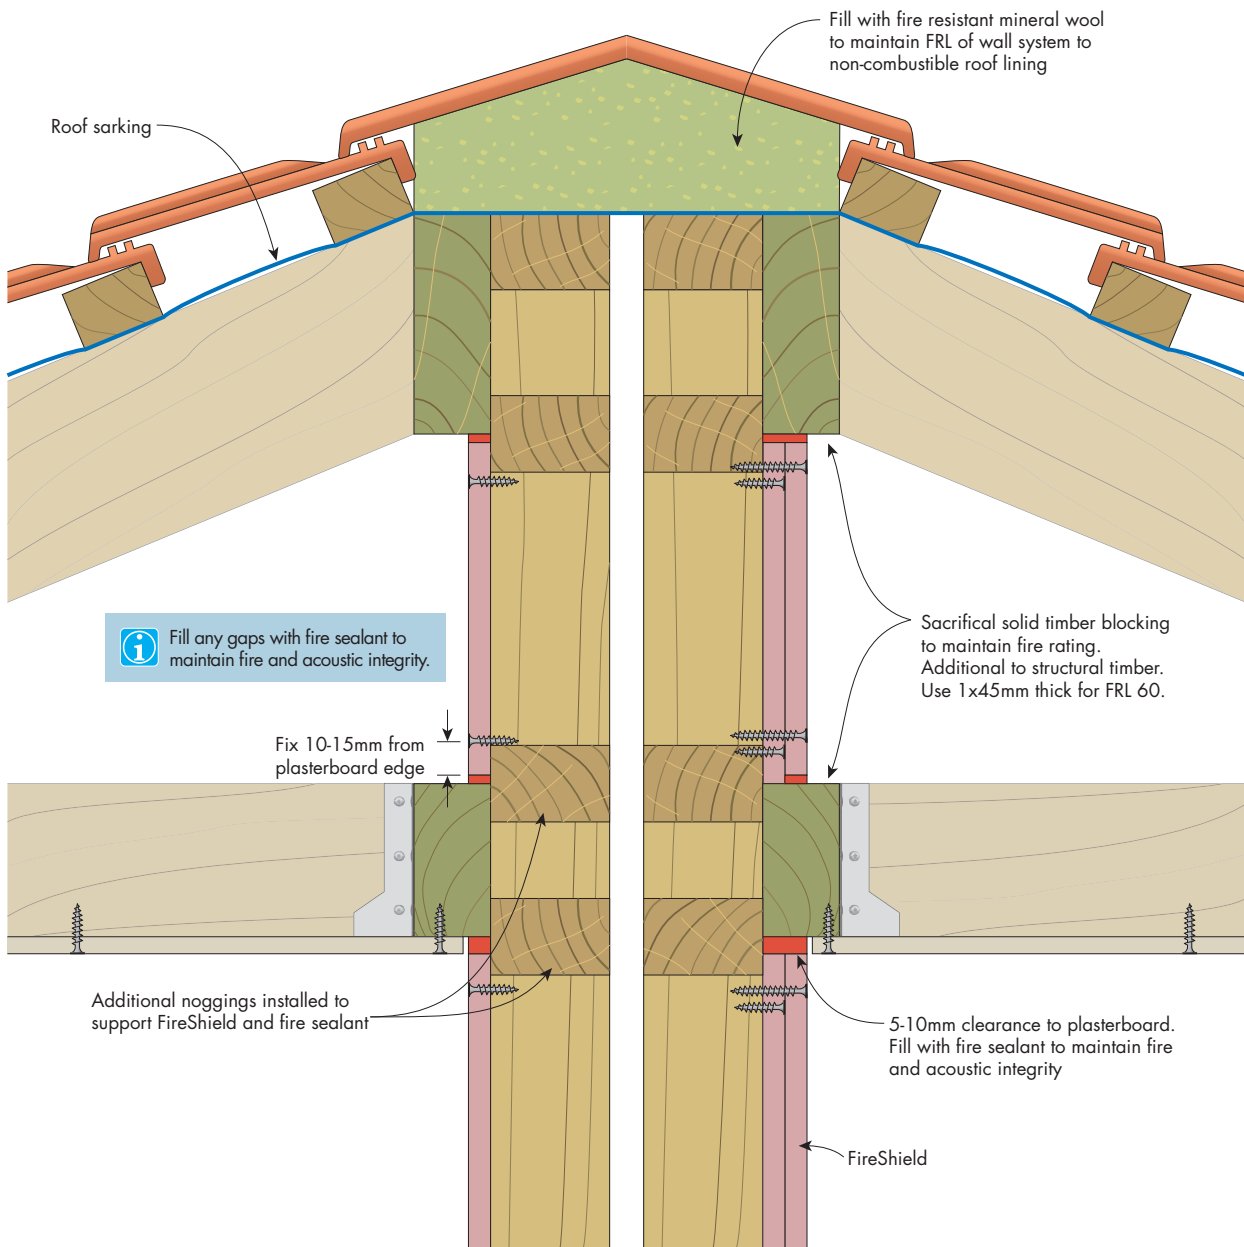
Separating Wall with Perpendicular Roof Trusses
